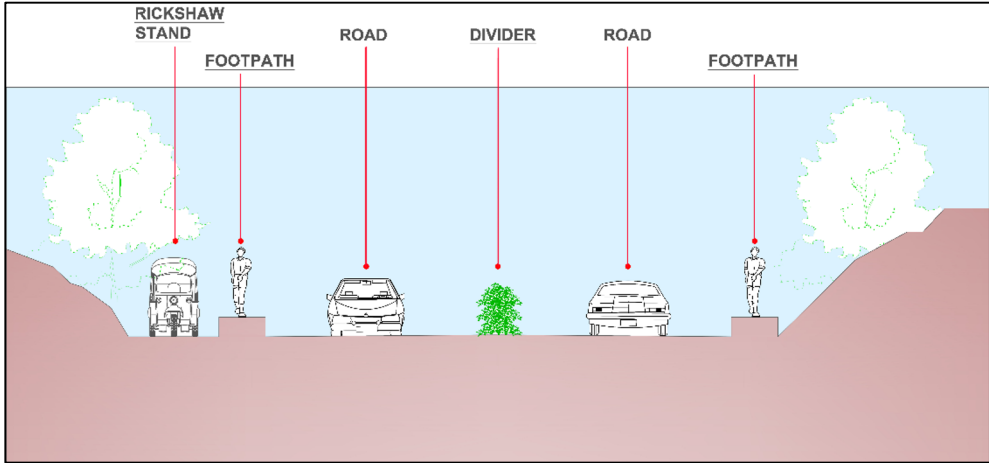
Proposal Elevation – Proposed Footpath and Rickshaw Stand/Parking Location.
